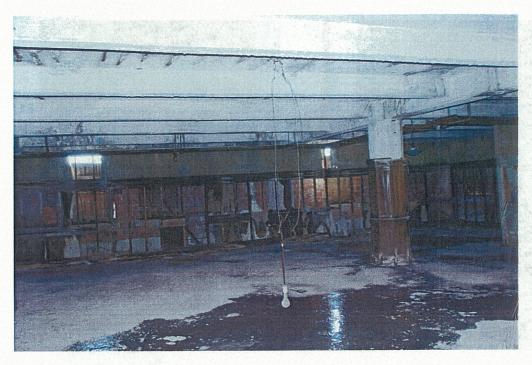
2^{nd}$  (Mezzanine) Floor Exposed abandoned utilities and showroom wood work on walls and columns shown. Floor covered with ice and fallen plaster.
